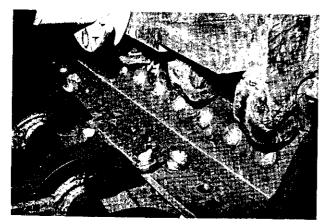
Typical failure mode of riveted "T" connection sheet piles subjected to two-directional tension
